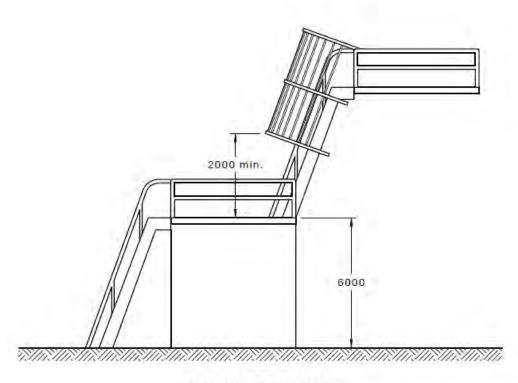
HANDRAIL DETAIL AT TOP OF INCLINED LADDER
